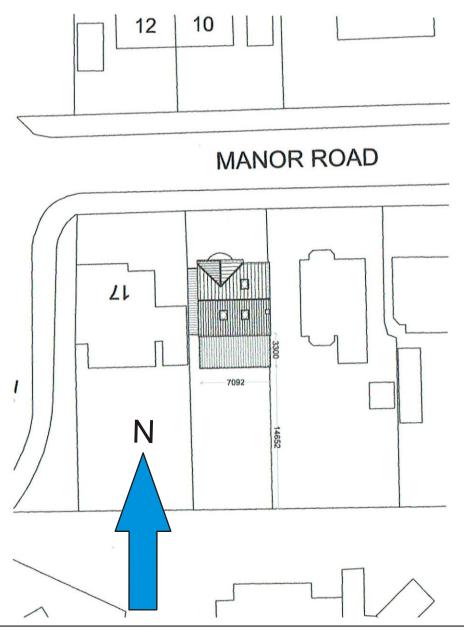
Block plan showing the proposed layout of the development site at 15, Manor Road at an original scale of 1:200, (not to scale), (extract from Architects plan).
